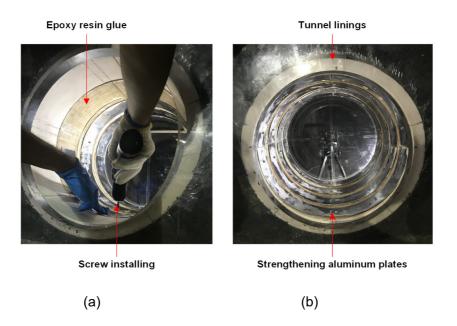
modelling the steel plate strengthening for existing segmental tunnel linings using aluminum steel plates (a) Installing the aluminum plates (b) The final strengthened tunnel
